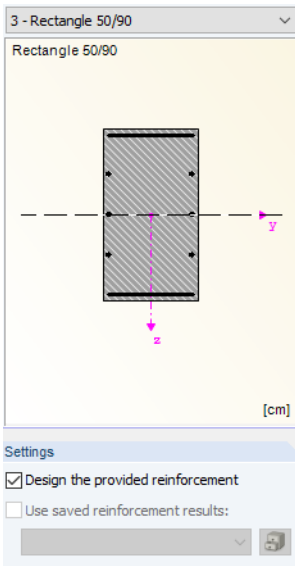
Window 1.6 Reinforcement, tab Longitudinal Reinforcement
